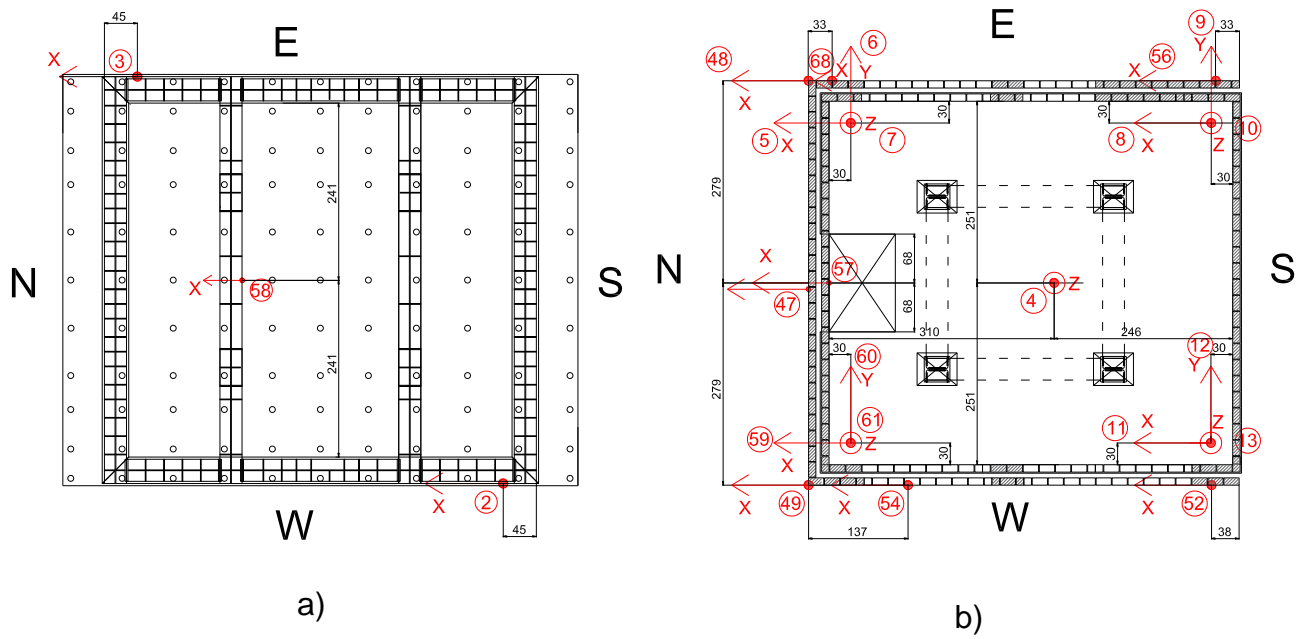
Accelerometer plan views: a) foundation level; b) first-floor level (R.C. diaphragm).
